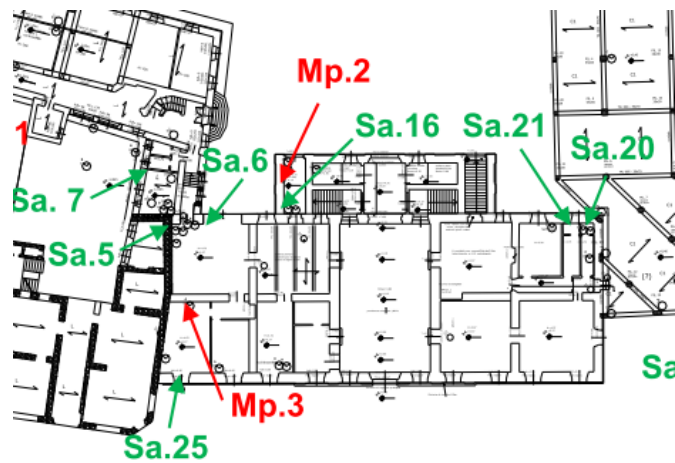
Location of plaster removal (Sa) and flat jack tests (Mp) at the ground floor of building A.
